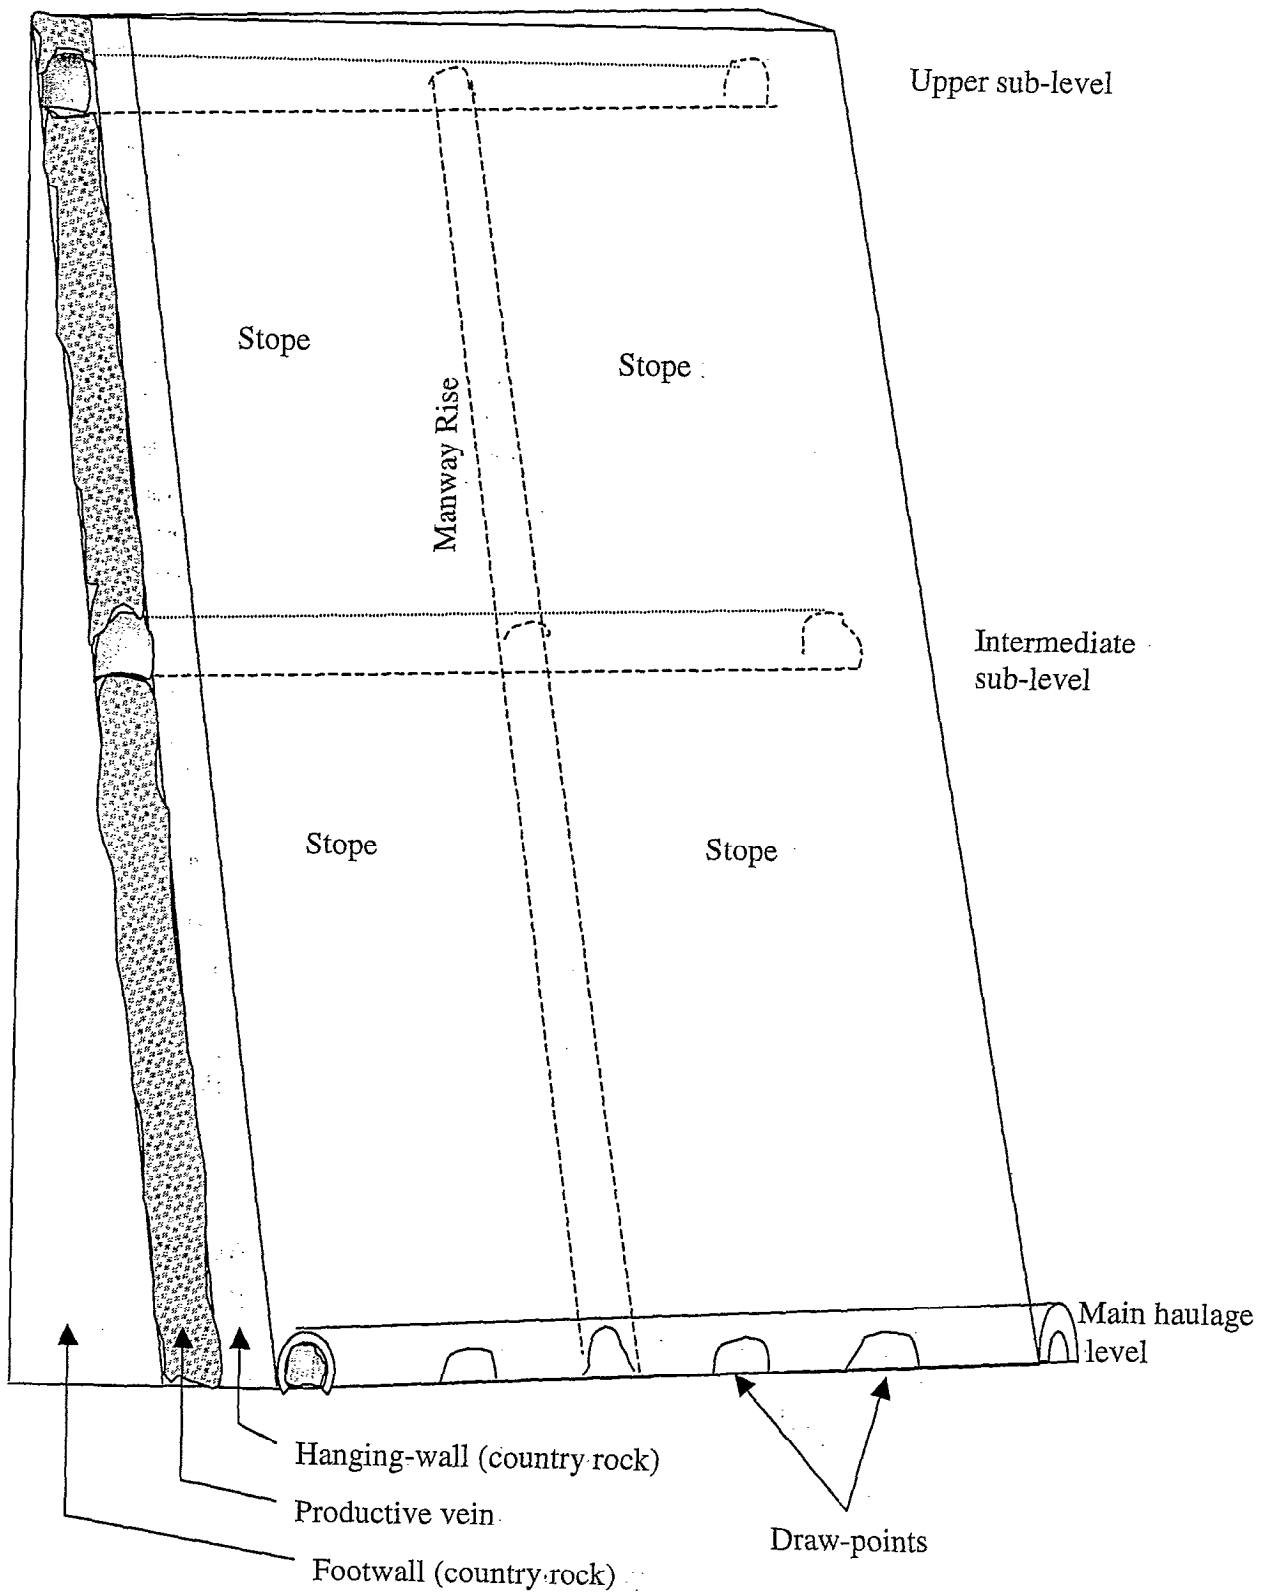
Layout of typical sub-level stoping workings in a near-vertical mineral vein.
